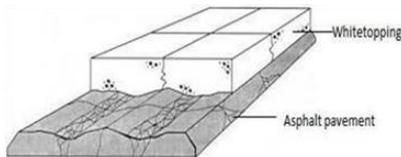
Schematic diagram of a pavement structure with whitetopping [5]
